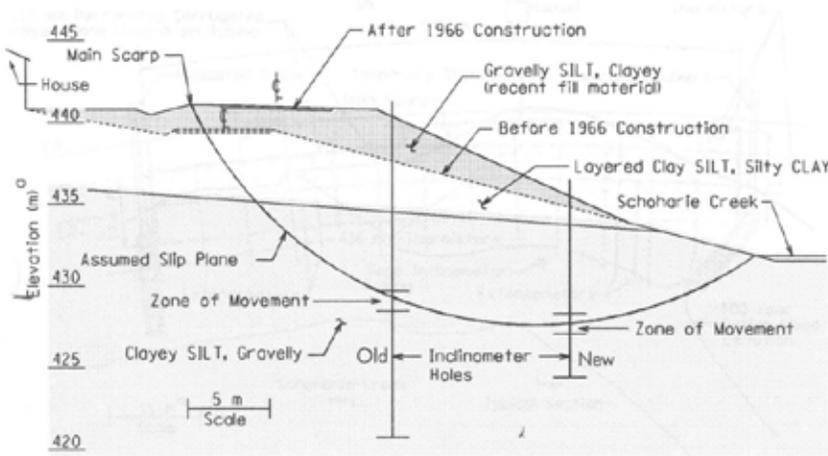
Cross-section of NY Route 23A slope failure (Jutkofsky et al., 2000).
